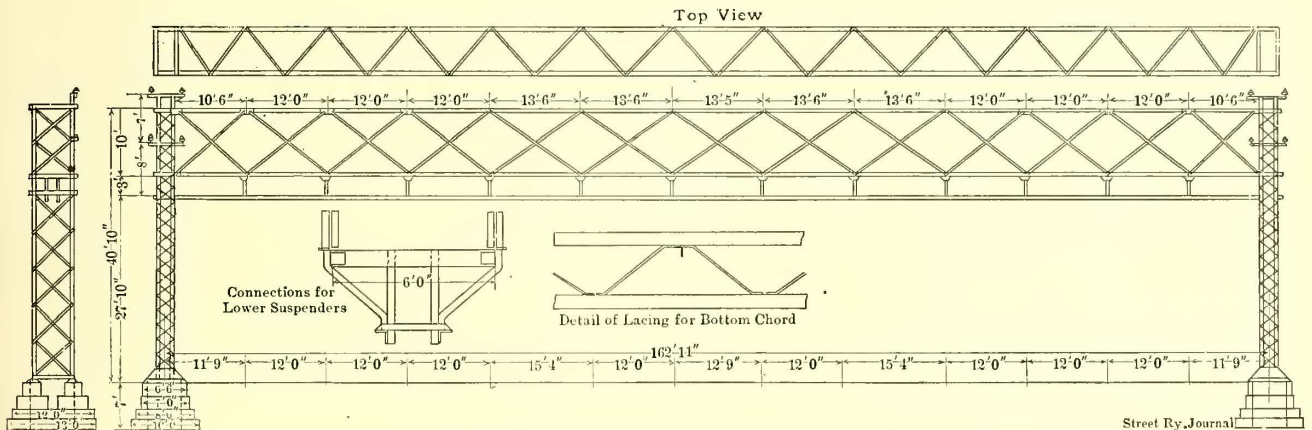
TWELVE-TRACK OVERHEAD BRIDGE
